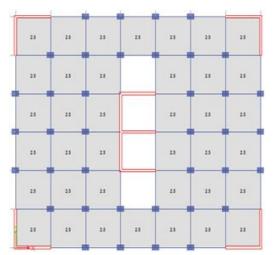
Plan of Building at 1st to  $9^{th}$  and  $11^{th}$  to  $20^{th}$  Floor level (LL = 2.5 kN/sqm)
